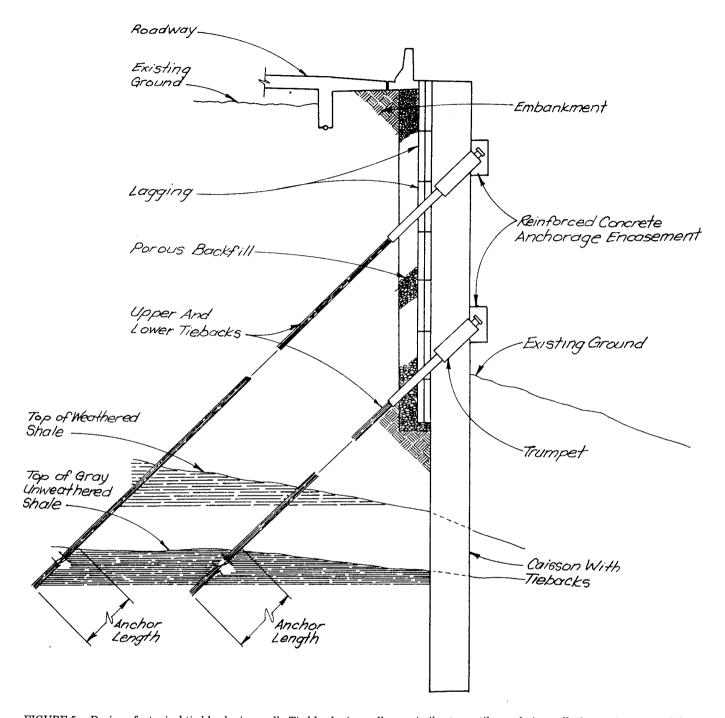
Design of a typical tied-back pier wall. Tied-back pier walls are similar to cantilevered pier walls, but resistance to sliding is increased by adding steel tiebacks anchored in stable shale bedrock.
